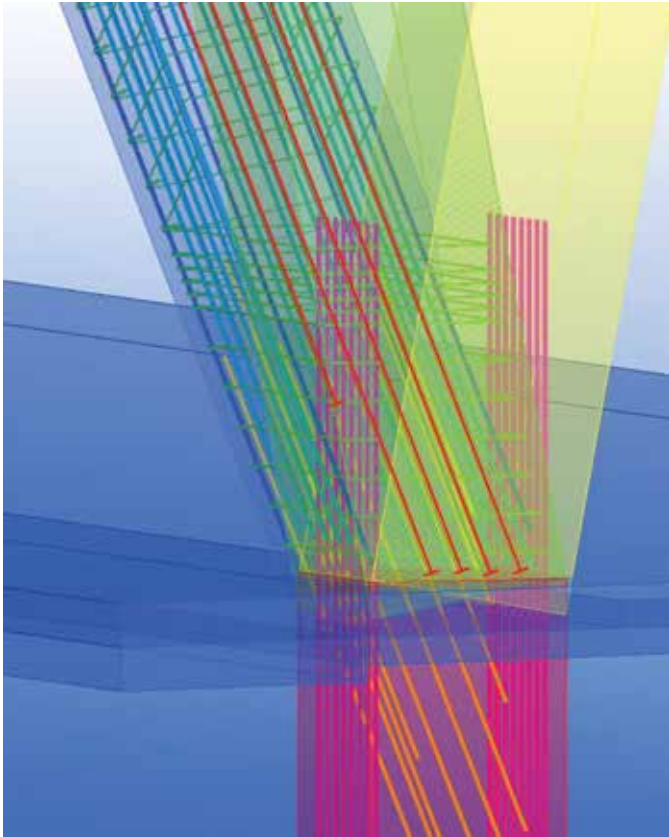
A Tekla 3-D model was used for reinforcement coordination at the base of the tree columns
